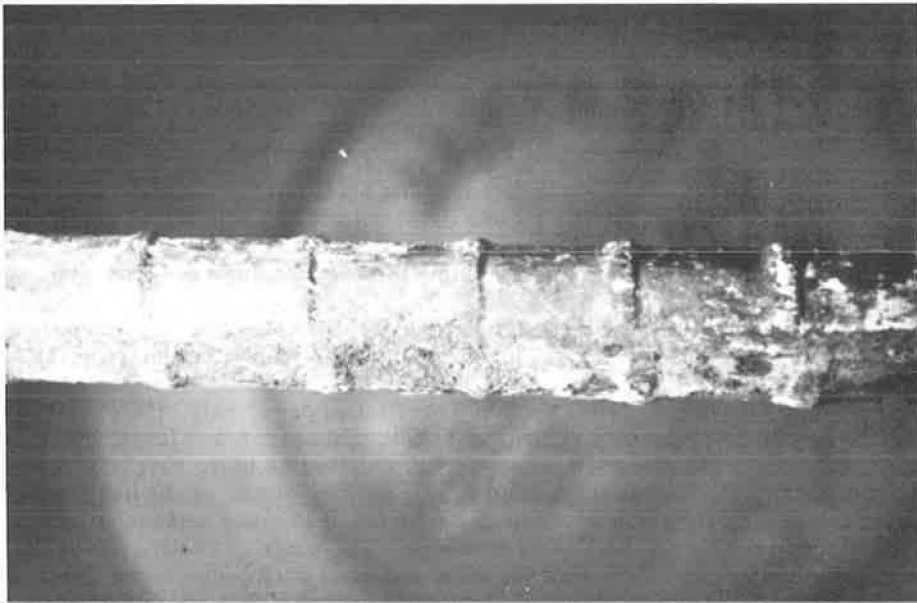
Condition of longitudinal reinforcement bar in the vicinity of a longitudinal crack.
